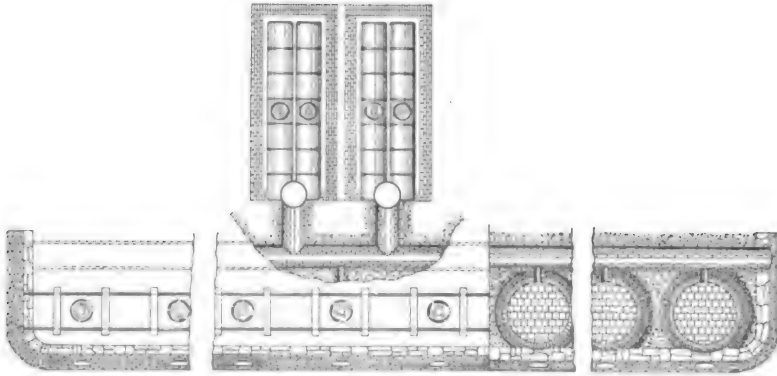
TOP VIEW AND HORIZONTAL SECTION.
